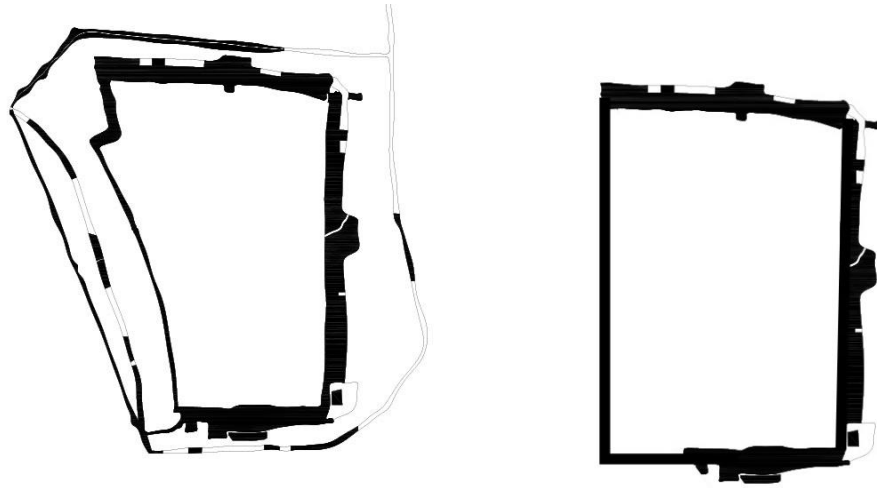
Site plan of DhormopalerGarh after excavation Source: Department of archeology , ministry of cultural affairs and plan of DhormopalerGarh
